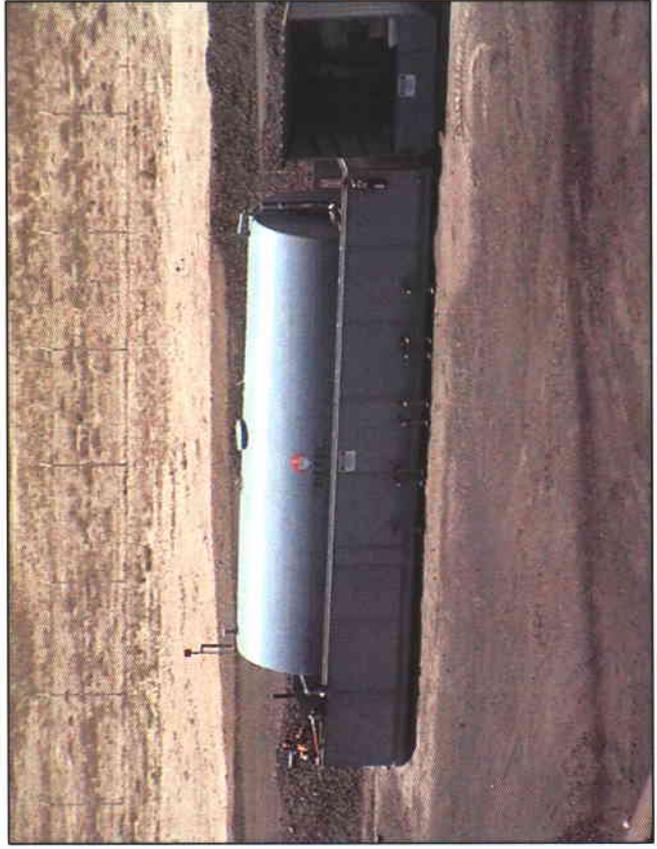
Diesel fuel tank with secondary containment per site SPCC Plan.
